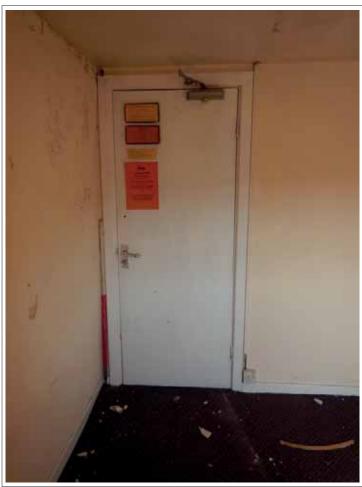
Doorway in Room 2.2, looking north. 1m scale.
